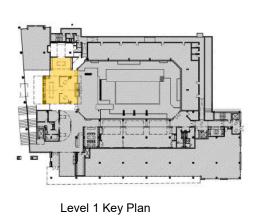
| Level 1 Floor Plan - Main Lobby + Concierge Desk
